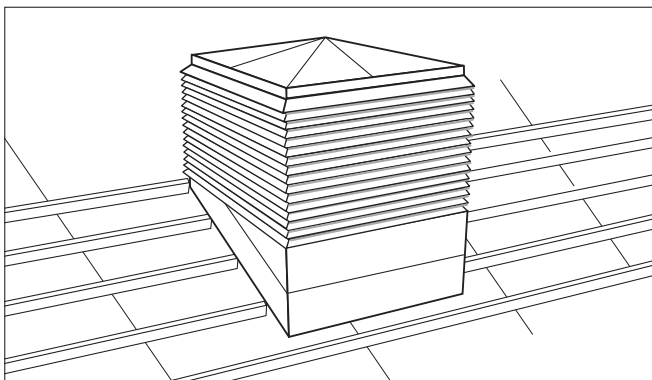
Pyramidal Roof Terminal with mitred corners.
